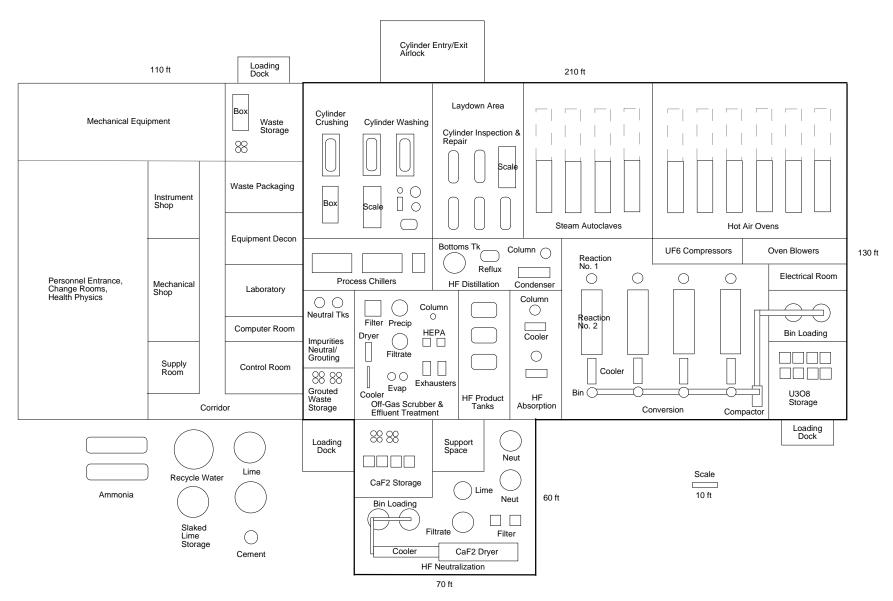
Process Building General Arrangement Conversion to U3O8, AHF and CAF2
